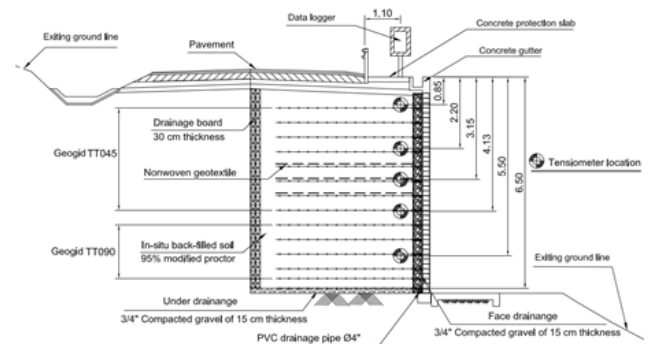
Cross-section of the studied geosynthetic-reinforced soil wall
